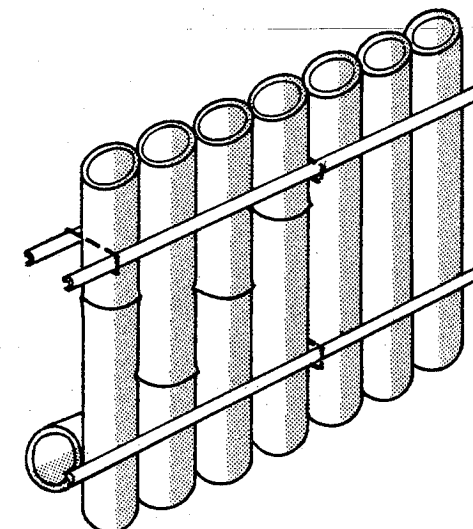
Wall of whole bamboo culms (after Janssen, 1995)
